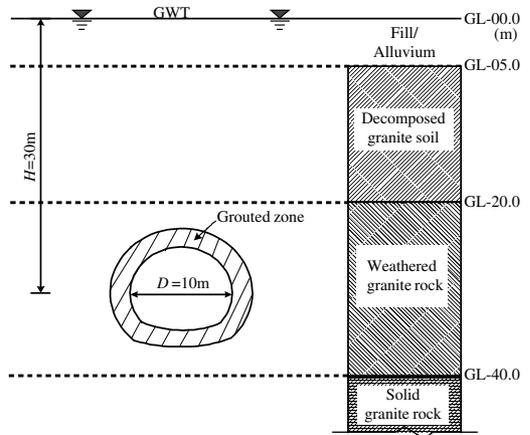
Ground profile for tunnelling condition analyzed (Yoo & Kim).
